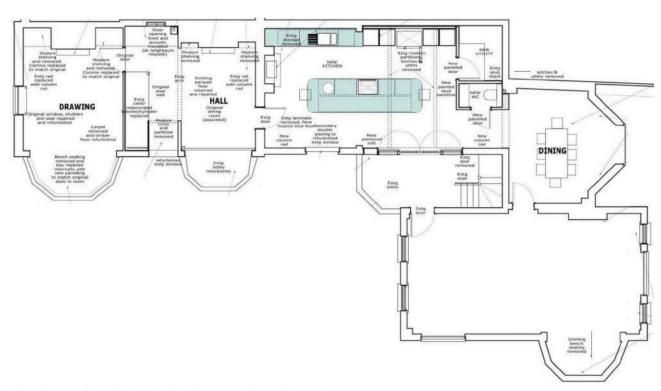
2013 Planning Application Proposed Ground Floor Plan
